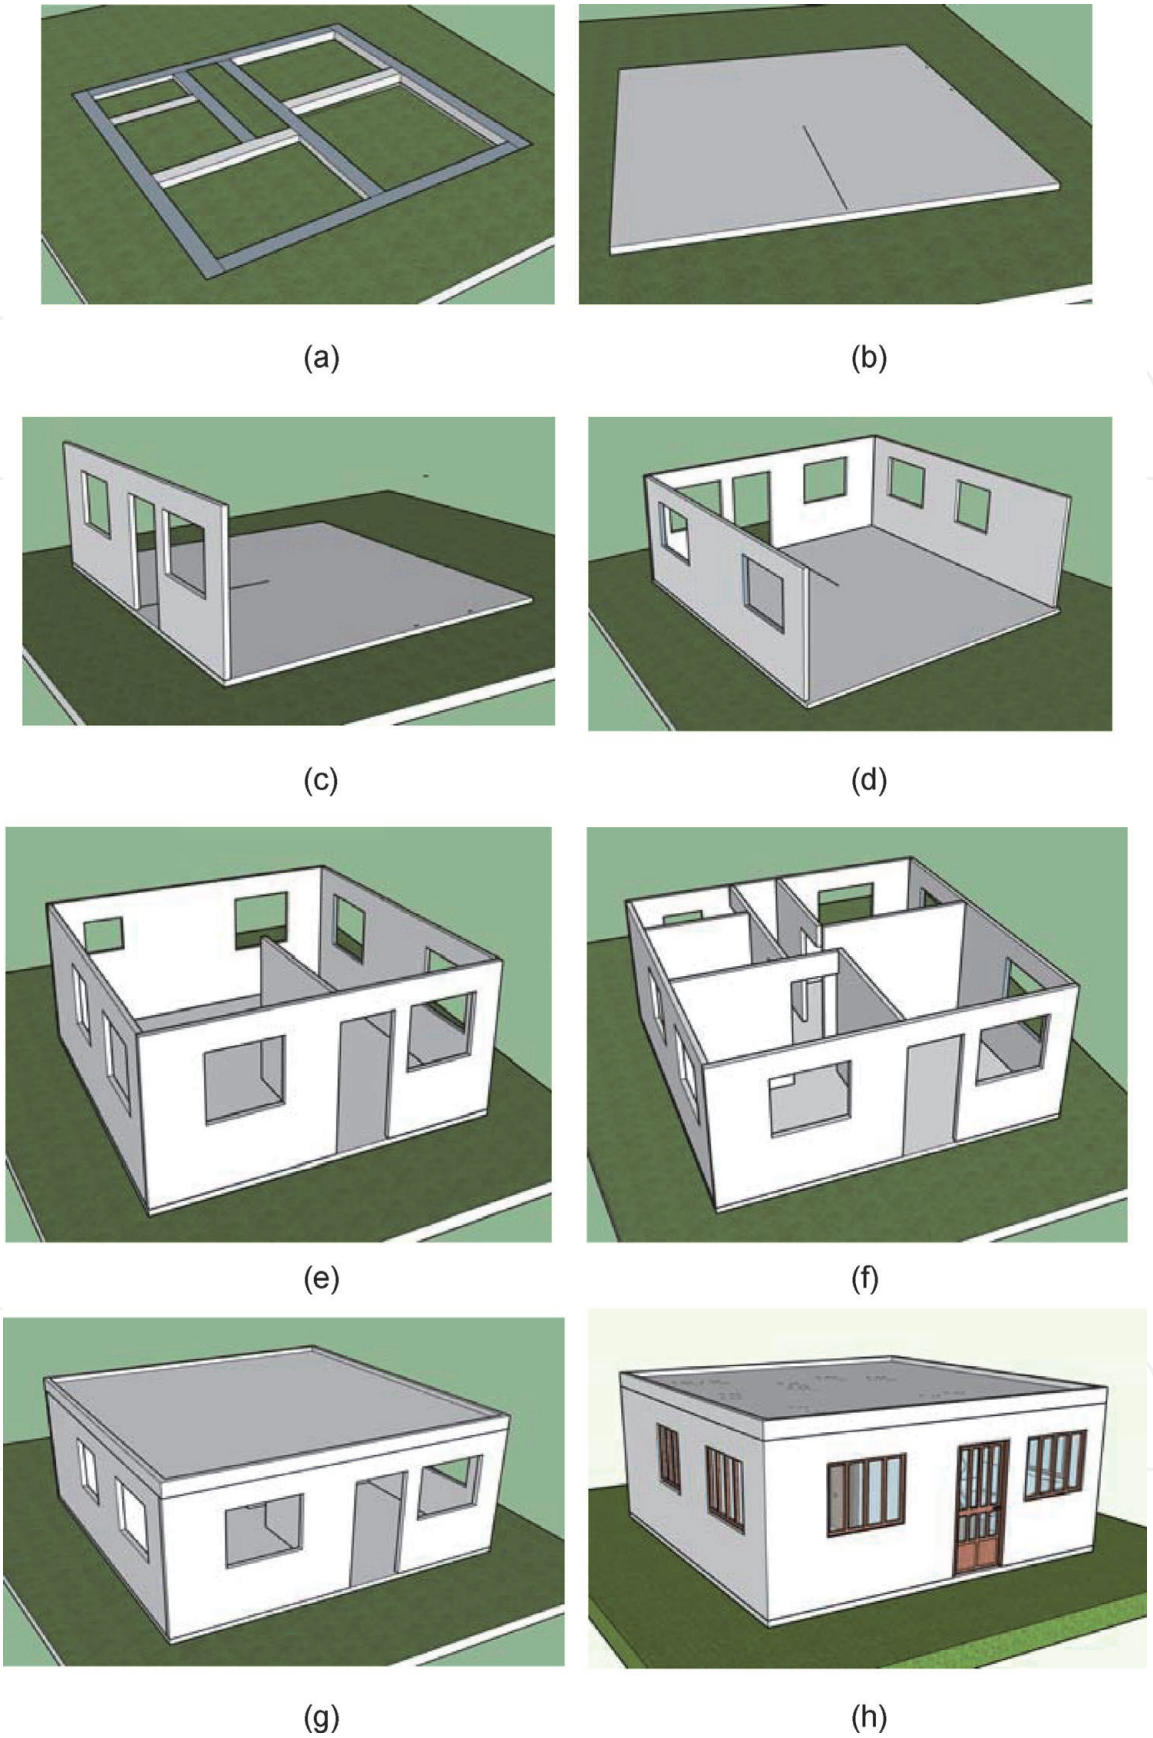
(a) Foundation installation. (b) Foundation slab. (c) Front wall installation. (d) Installation of sidewalls. (e) Installation perimeter wall. (f) Installation of interior walls. (g) Ceiling installation. (h) Completion of work finishes.
